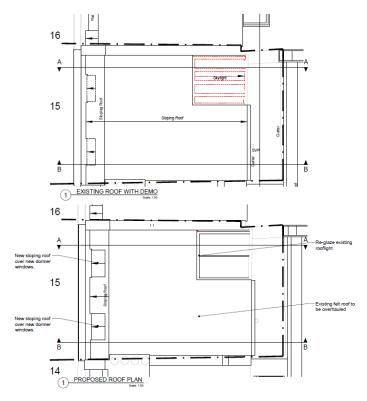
(above): Existing and proposed plans of the roof showing internal and external alternations proposed
